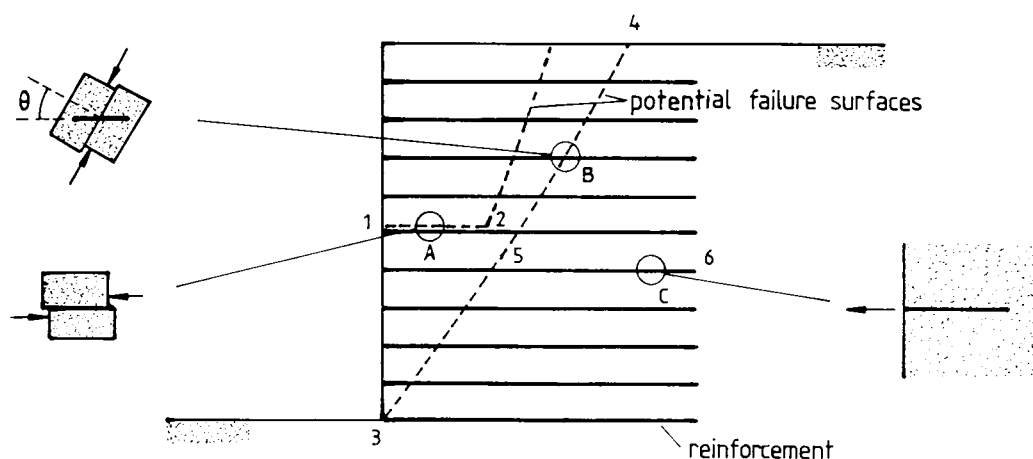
Failure Mechanisms in a Reinforced Soil Retaining Wall.
